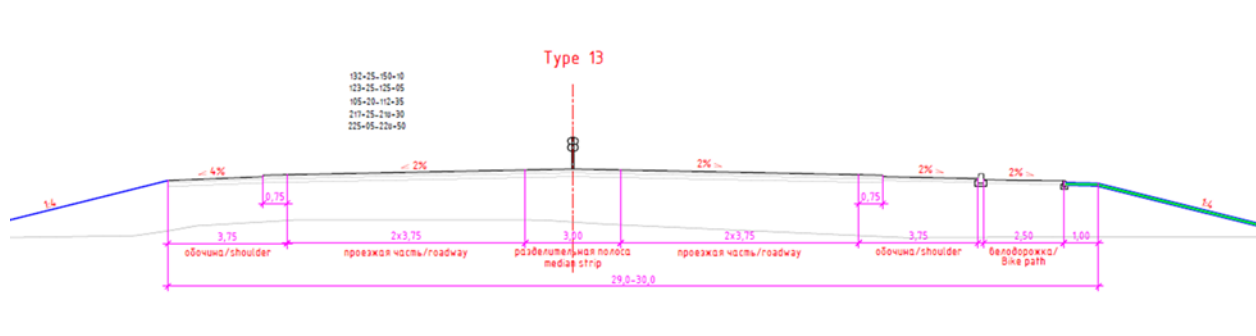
Typical cross section outside settlements (4-lanes. Category I)
